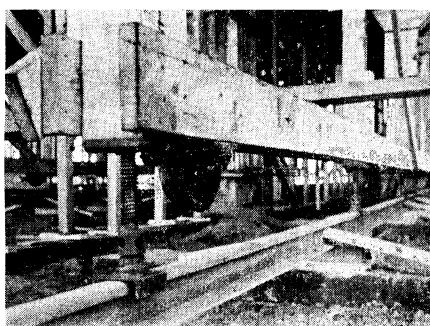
(above)—One arrangement of wheels, rails, and jacks for the support and rolling of mobile centering
